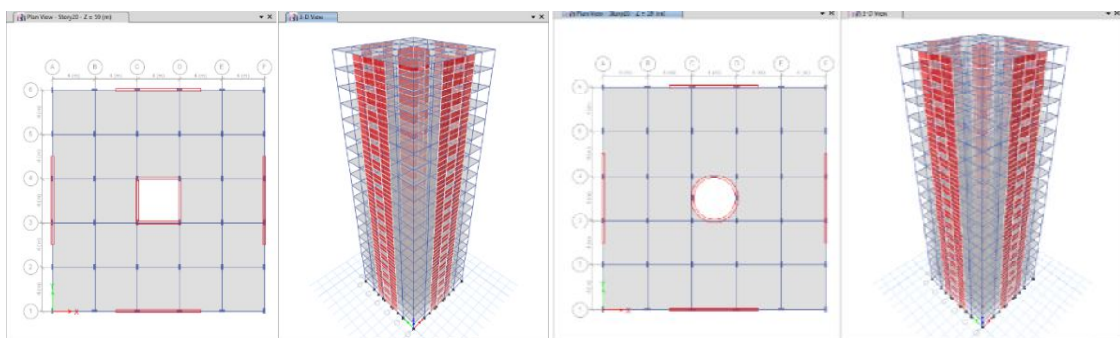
Model 1 (building with square Core wall and shear wall at the center of the Exterior frames)
